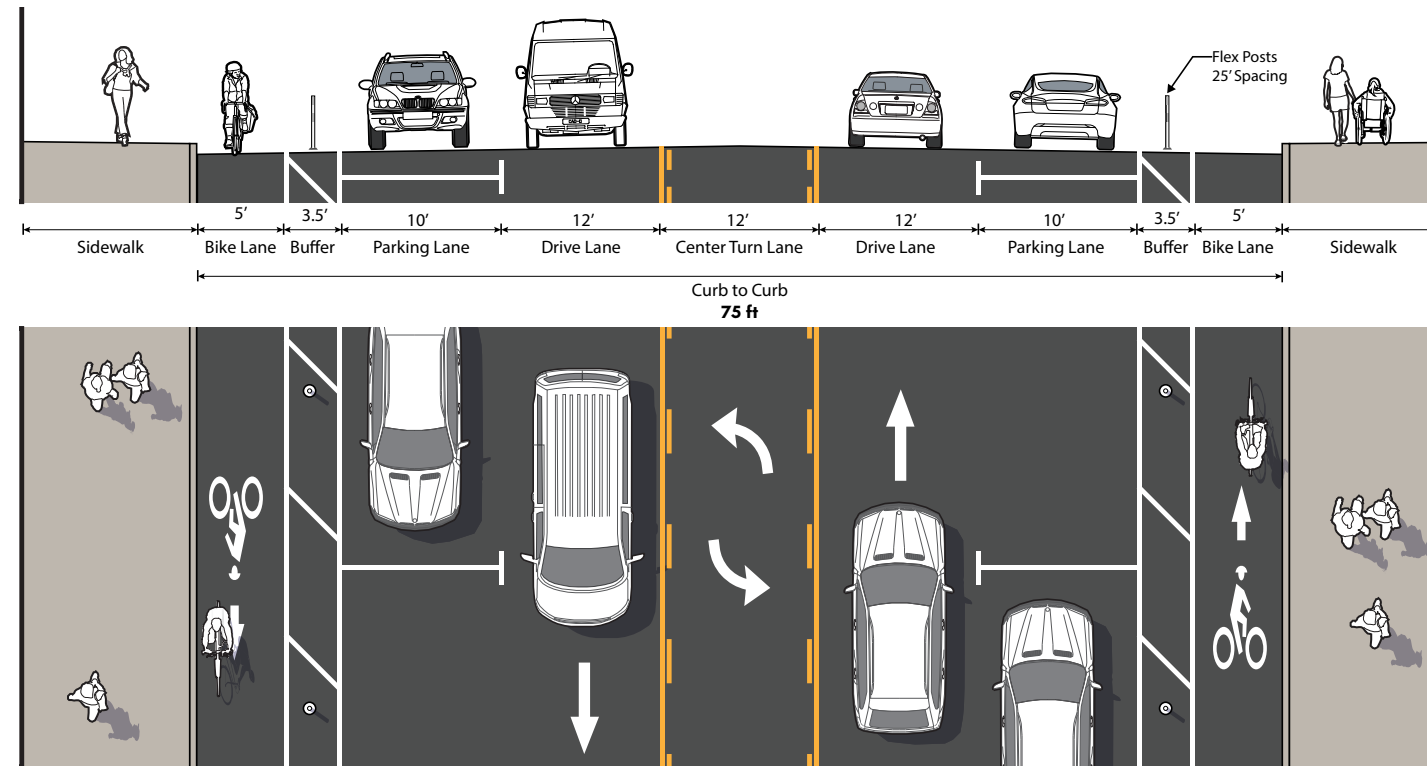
Design Option One: road diet with buffered bike lane section west of Cleveland Avenue (looking east). (Parking stripe above shown for illustrated purpose).
